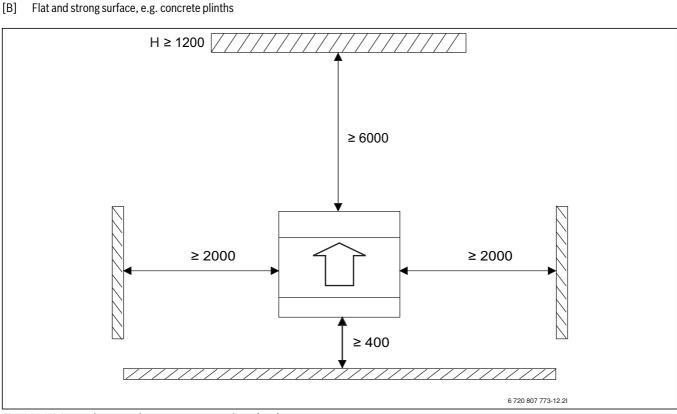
Minimum clearances heat pump - surroundings (mm)
